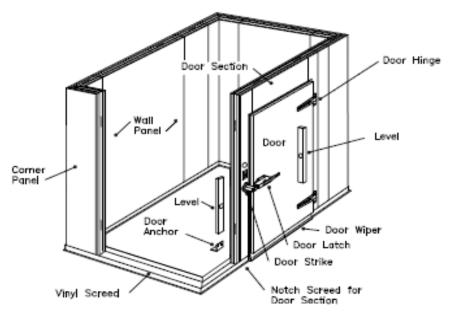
INSTALLATION OF DOOR SECTION - OVERLAP DOOR SHOWN - EXAMPLE ONLY
